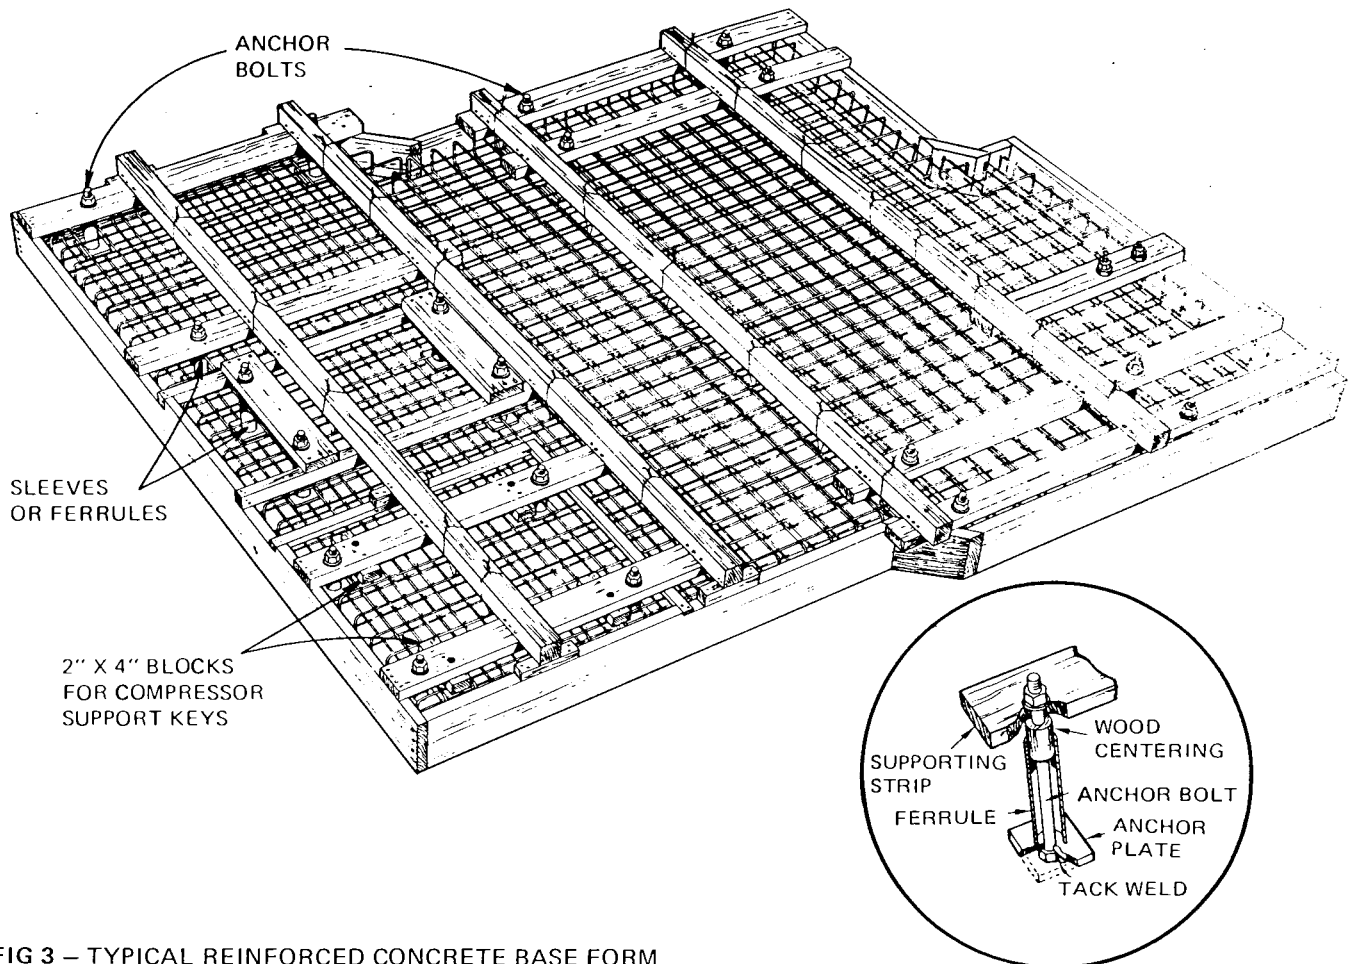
TYPICAL REINFORCED CONCRETE BASE FORM
